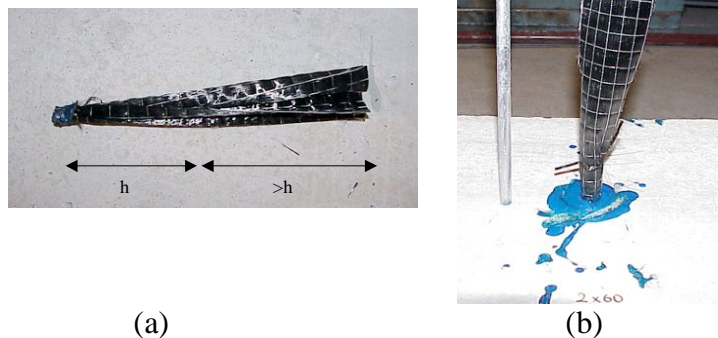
a) Rolled CFRP sheet (left) and b) CFRP anchor embedded into concrete (right)
